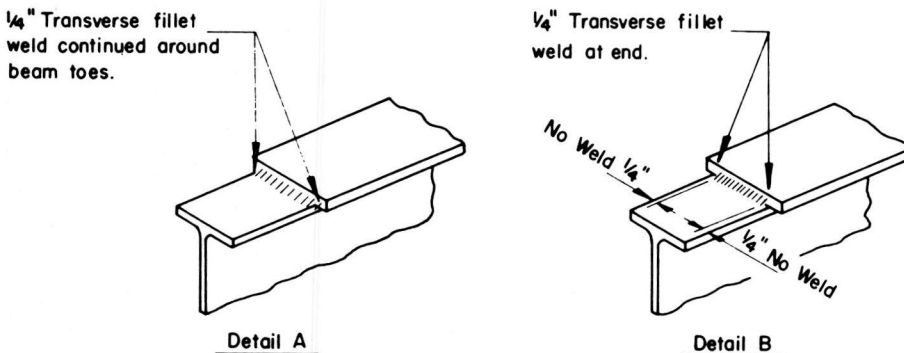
Schematic of end-weld details for wide cover plates.
